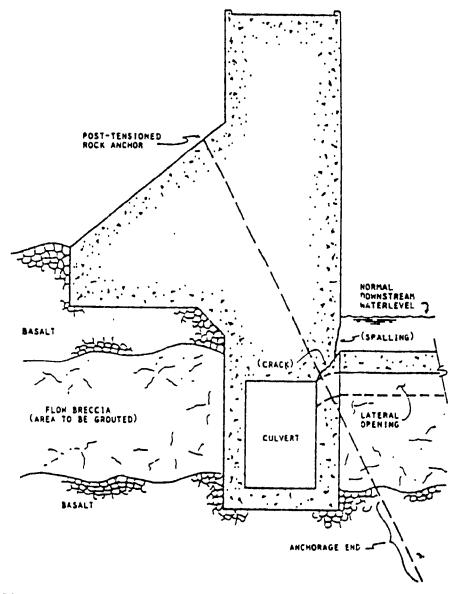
REPAIR OF CRACK BY POST-TENSIONED ROCK ANCHOR AT JOHN DAY NAVIGATION LOCK AND DAM, WASHINGTON<sup>62</sup>
